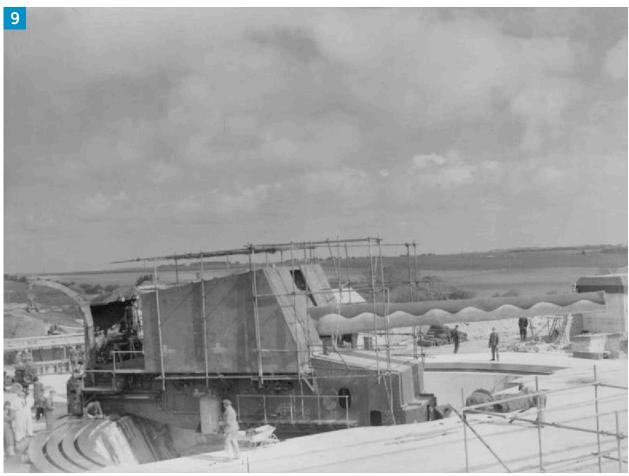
Wanstone Battry 15 inch gun under construction 1942. © IWM (H 19835)
